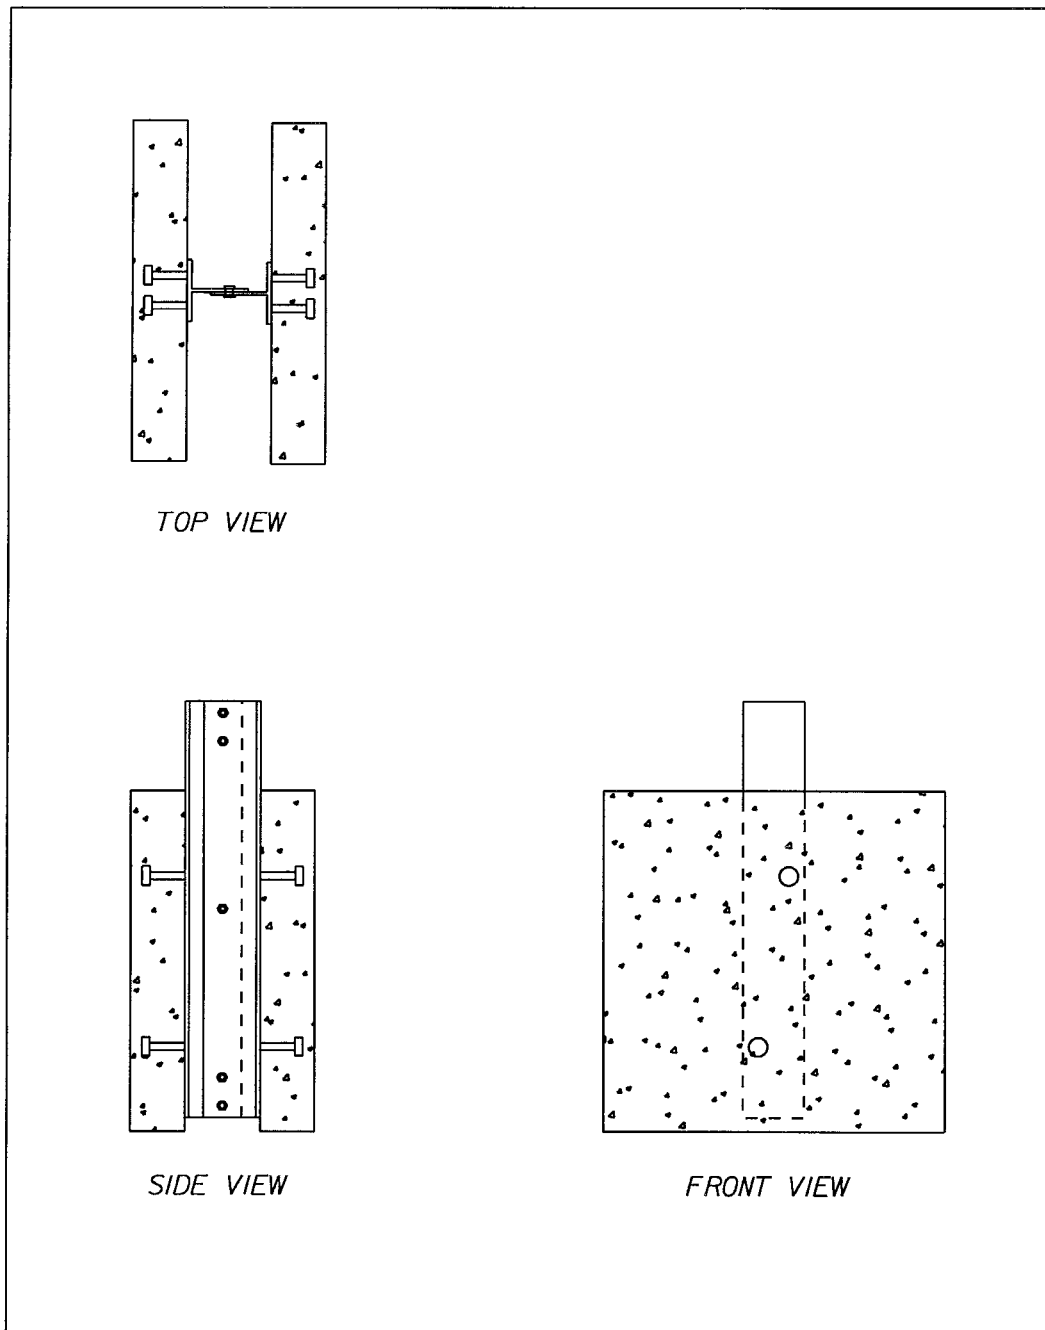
Solid Slab Push-Out Specimen with Studs Welded Off-Center on Flange (Reinforcing steel not shown)
